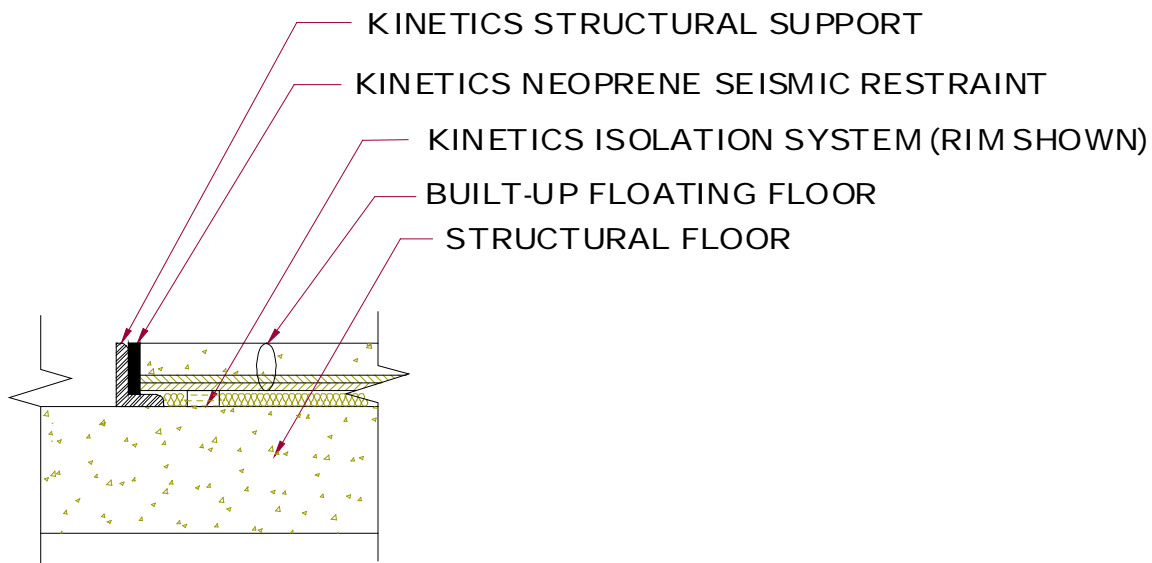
Floating Floor Perimeter Isolation w/Structural Support.
